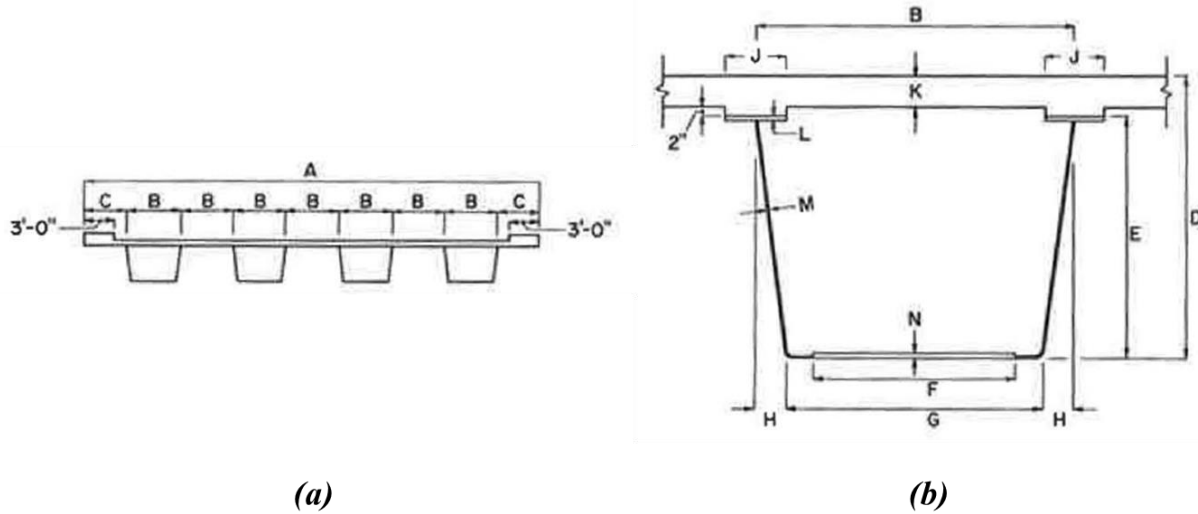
Typical Midspan Cross-sections for Bridges in the Analytical Study for the: (a) Bridge and (b) Girder (Johnston & Mattock, 1967)
